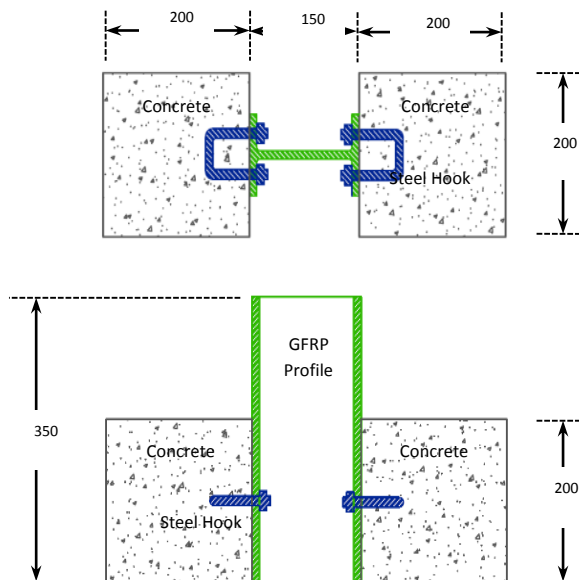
Geometry of the test specimen (mm): plan (top) and section (bottom).
